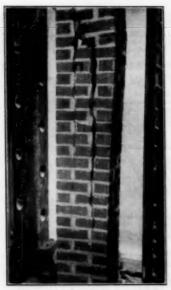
Failure of Plain Waupaca Brick Column No. 17.
